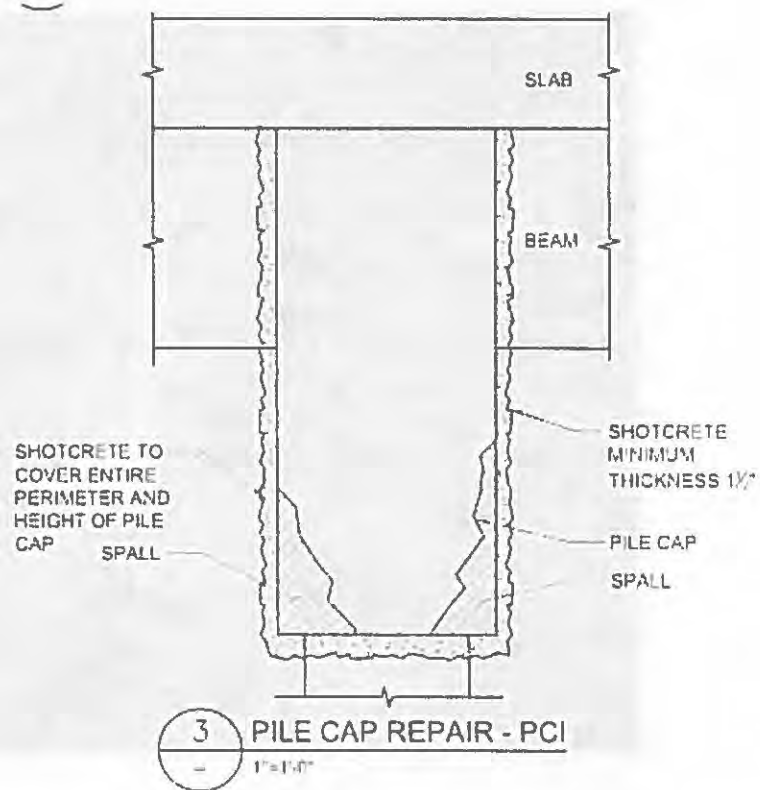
Shotcrete Cap Beam Repair (Alternative not shown, notes as shown below)
